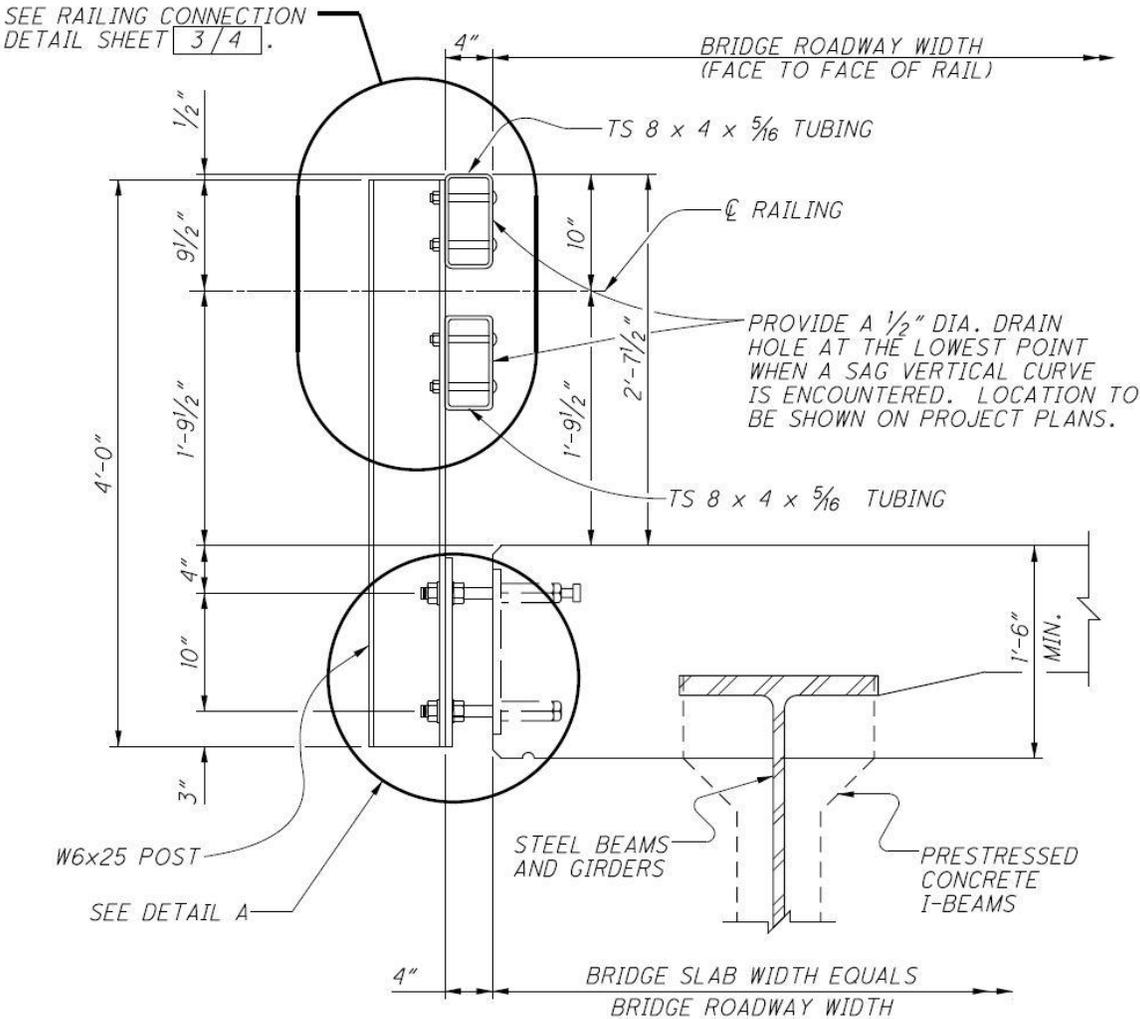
Existing ODOT Side-Mounted Steel Tube Bridge Railing [1]
